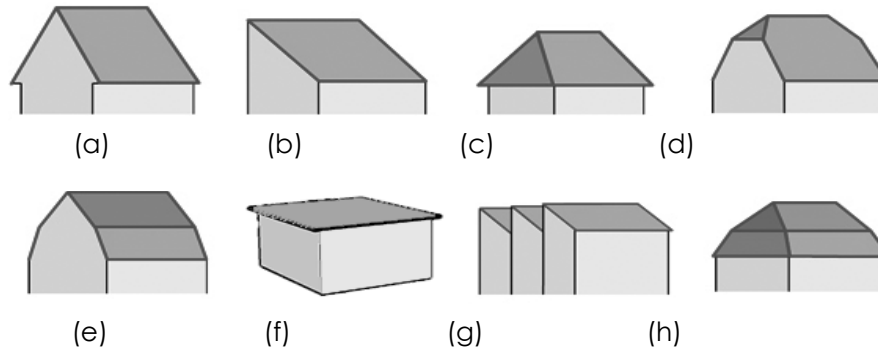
Major architectural roof styles (a) gable roof (b) shed roof (c) hip roof building (d) half hipped roof (e) mansard roof (f) flat roof (g) saw-tooth roof (h) mansard hipped roof. From [www.projekt-service.de/dacharten.html].
